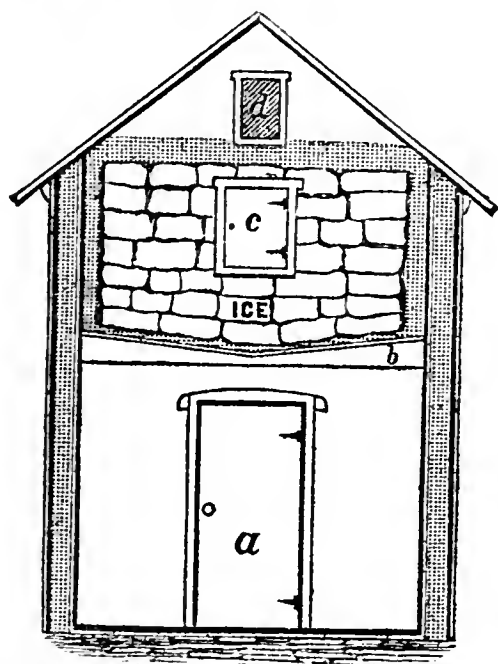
Elevation and Section of Out-Door Refrigerator.
